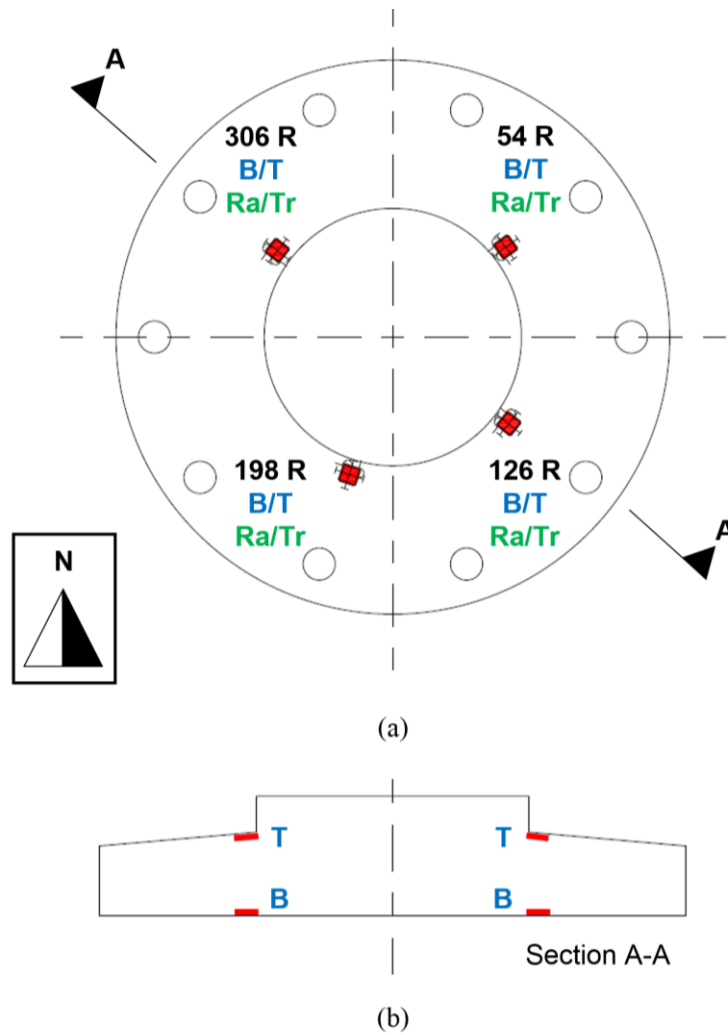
Instrumentation placement – raft: (a) plan view; (b) cross-section
